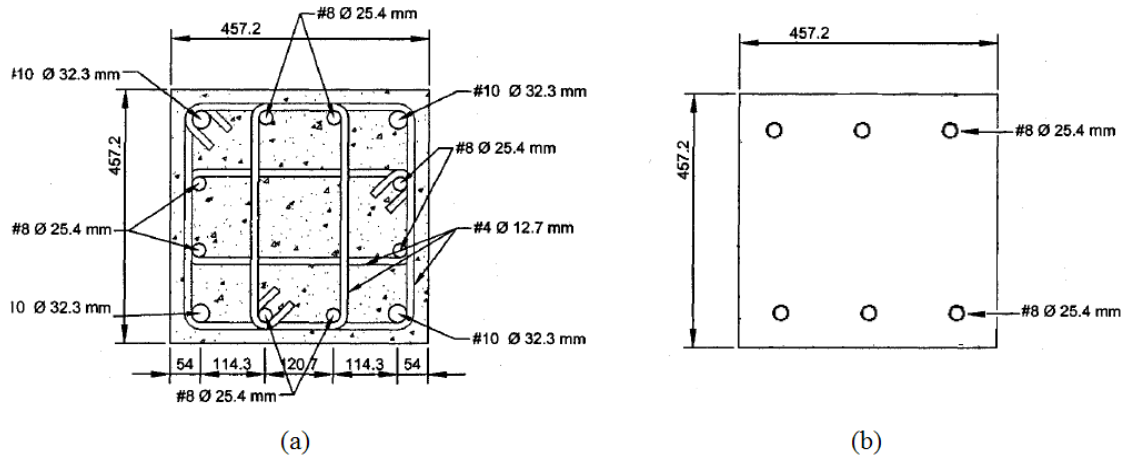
Details of as-built bridge components: (a) Column cross section (b) Beam cross section
